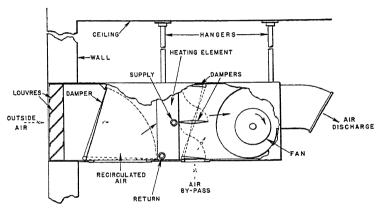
Suspended Type Unit Heater, Housed Type Fan
